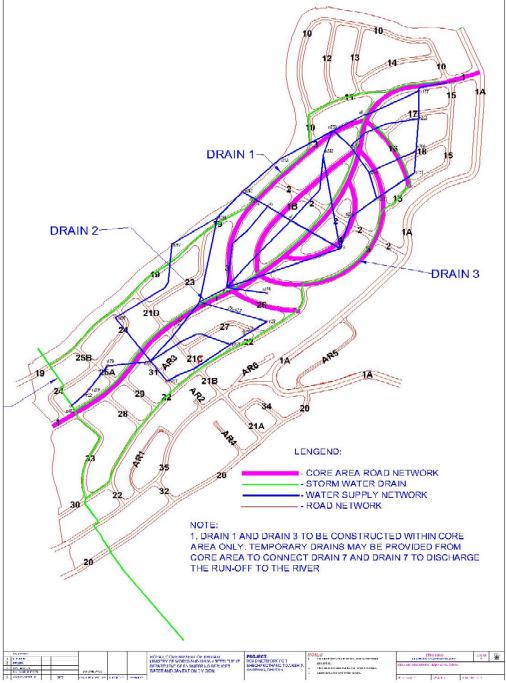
Layout of Proposed Storm Water Drains in Shechamthang (Ranibagan)
